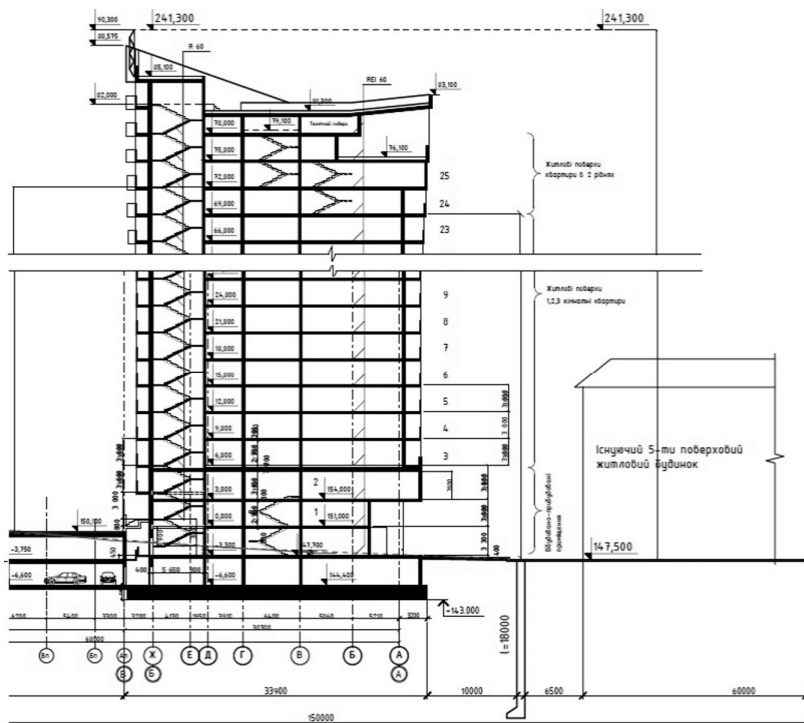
Section of the designed 25-story residential building and the existing 5-story residential building
